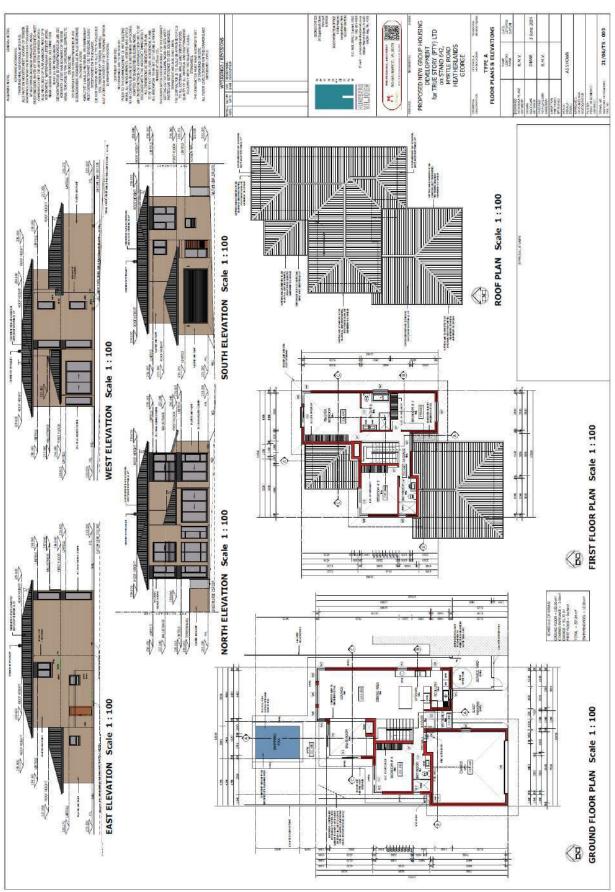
Floor Plans & Elevations (Please see Annexure F)
